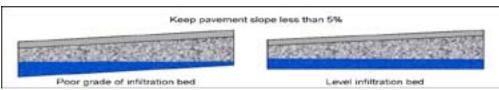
A level infiltration bed and limited pavement slope will maximize stormwater treatment and storage.
